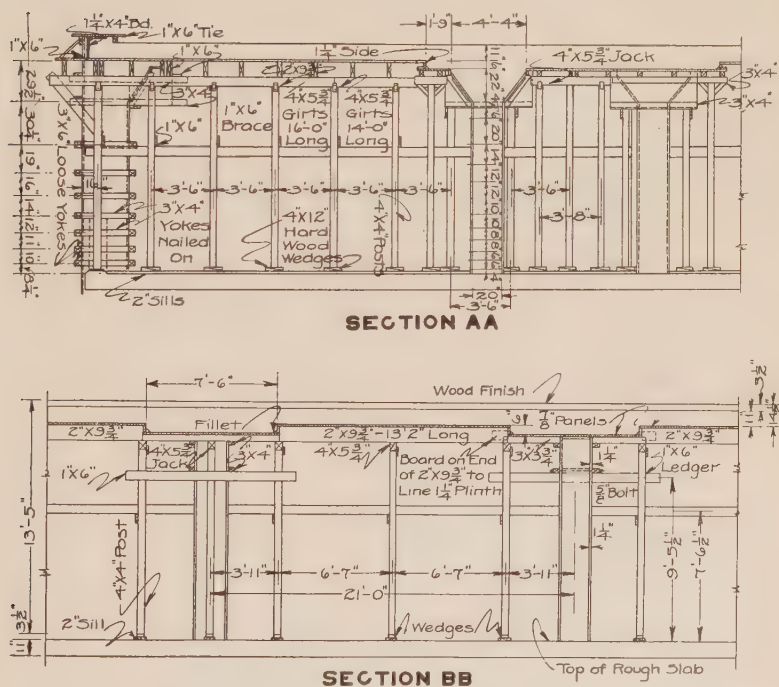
B.—TYPICAL ASSEMBLY OF FLOOR CENTERING.
